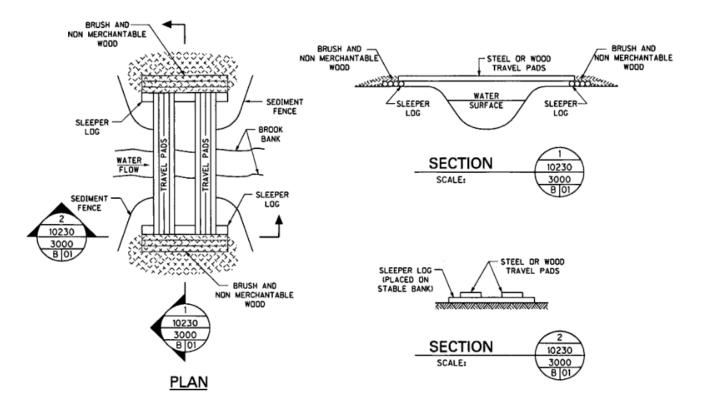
Example of a Temporary Bridge Crossing. Image Provided by NB Power.
